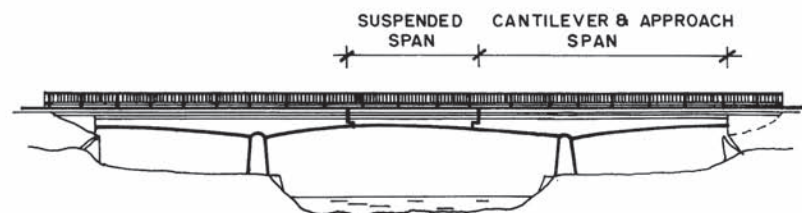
CANTILEVER & SUSPENDED SPAN
